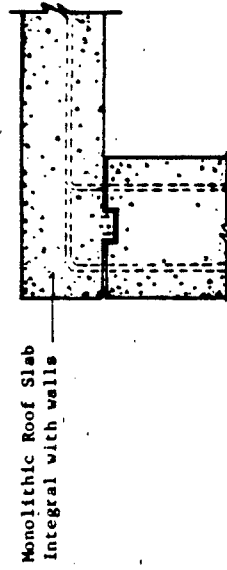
PRECAST WALL PANEL--JOINTING TECHNIQUE.
